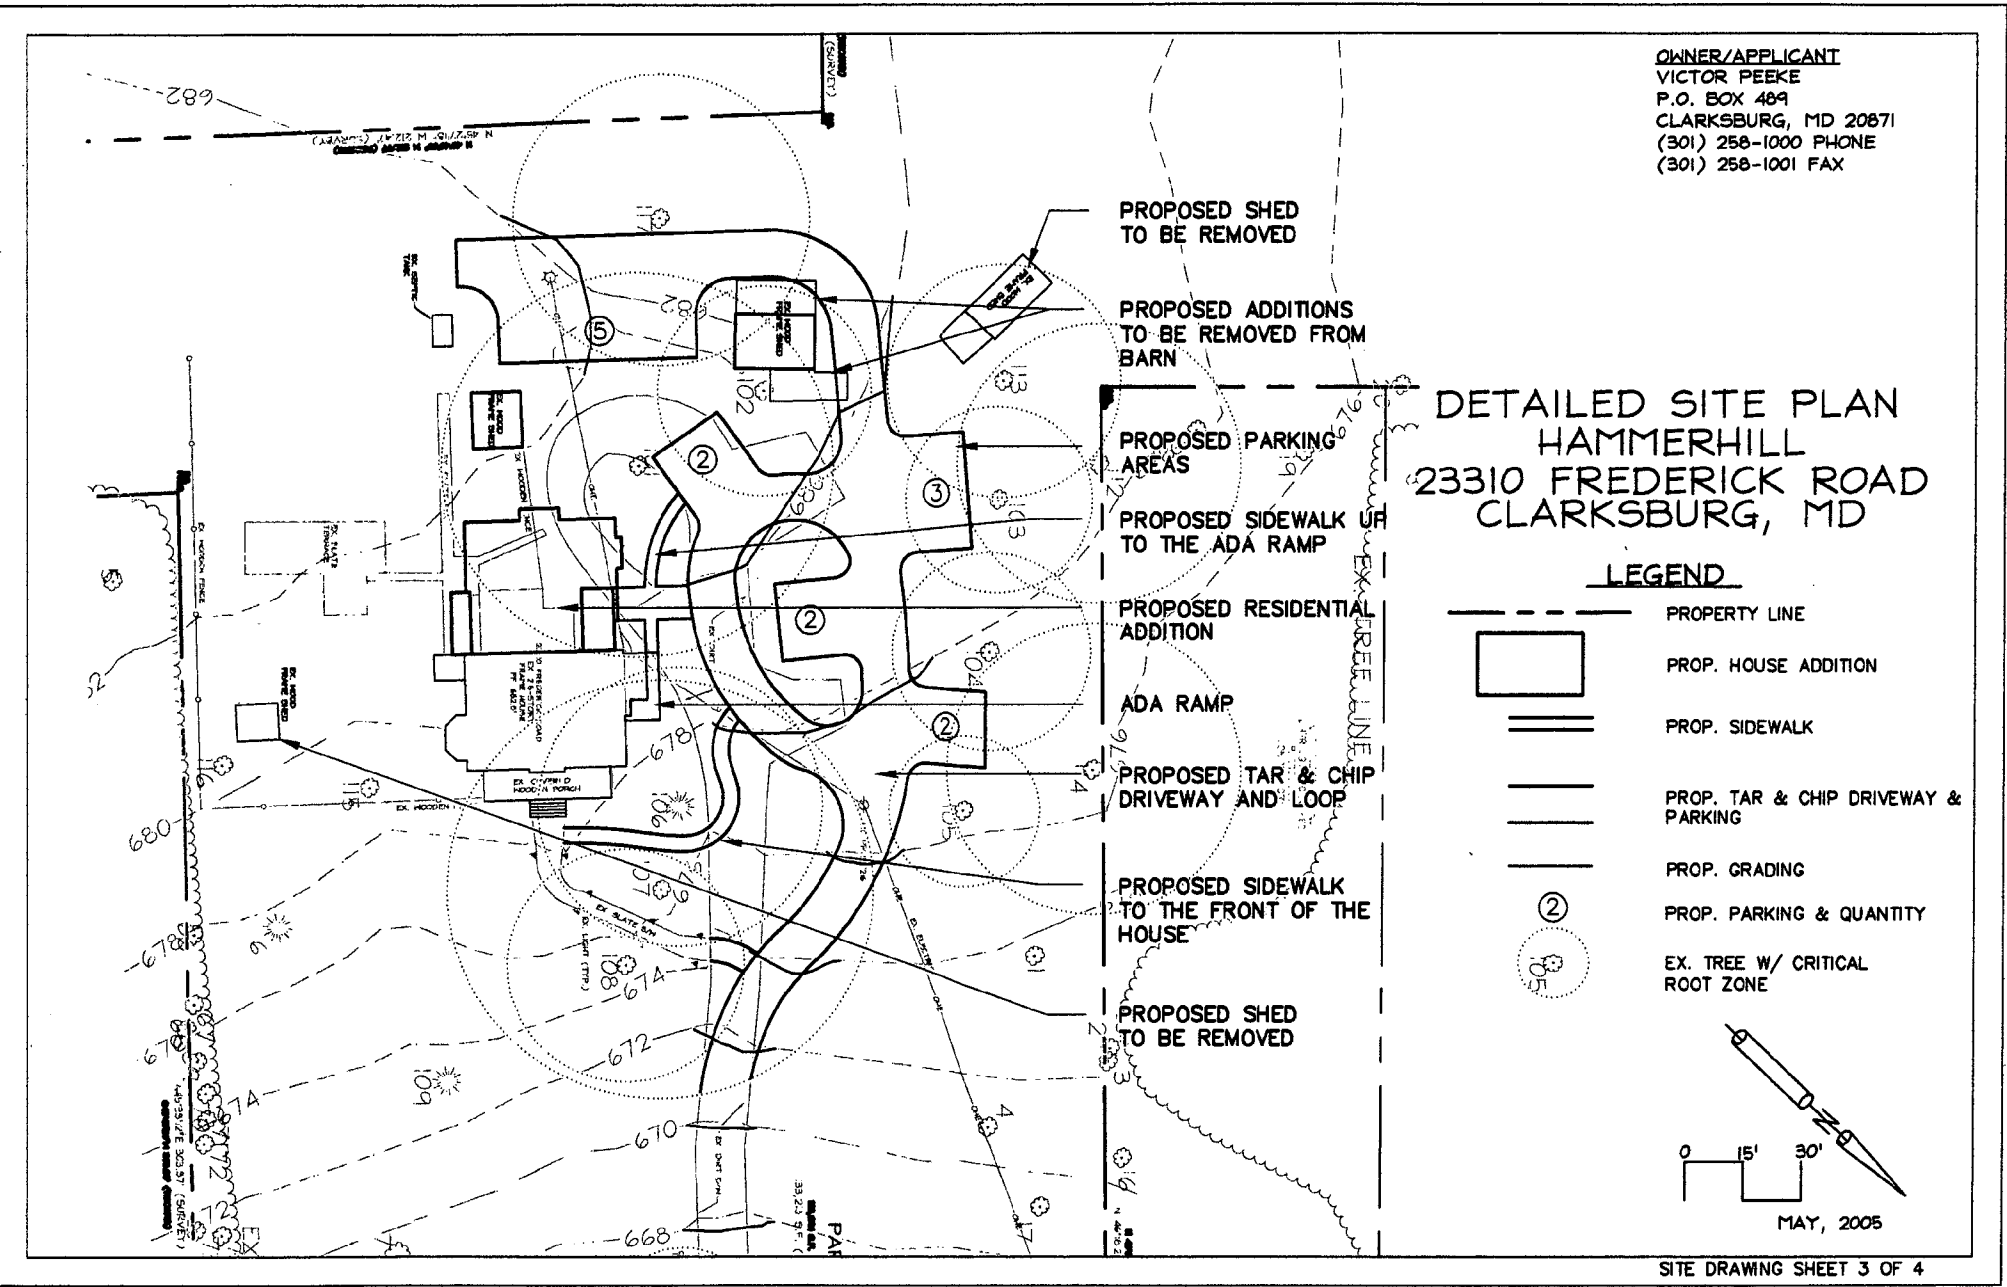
### DETAILED SITE PLAN HAMMERHILL 23310 FREDERICK ROAD CLARKSBURG, MD
